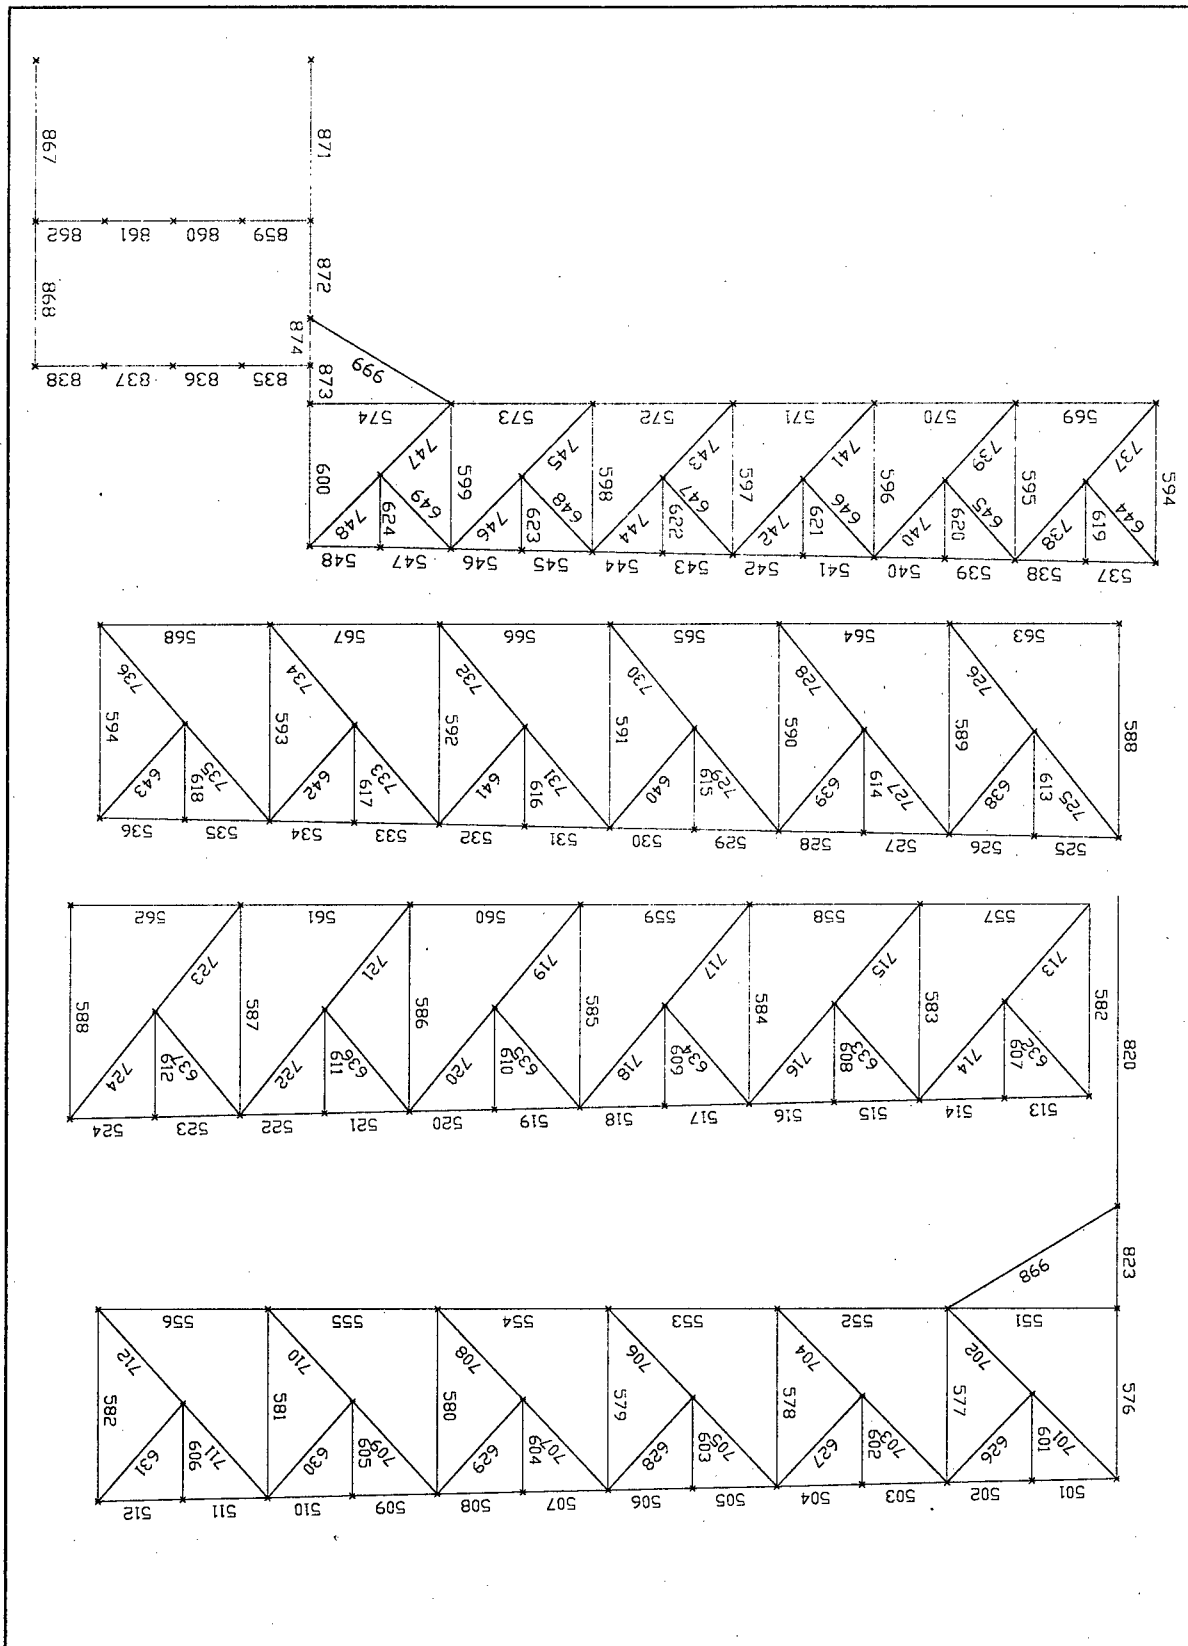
CCAD, TX, element numbers of Truss T1 with knee braces, Hangars 44 and 45.
